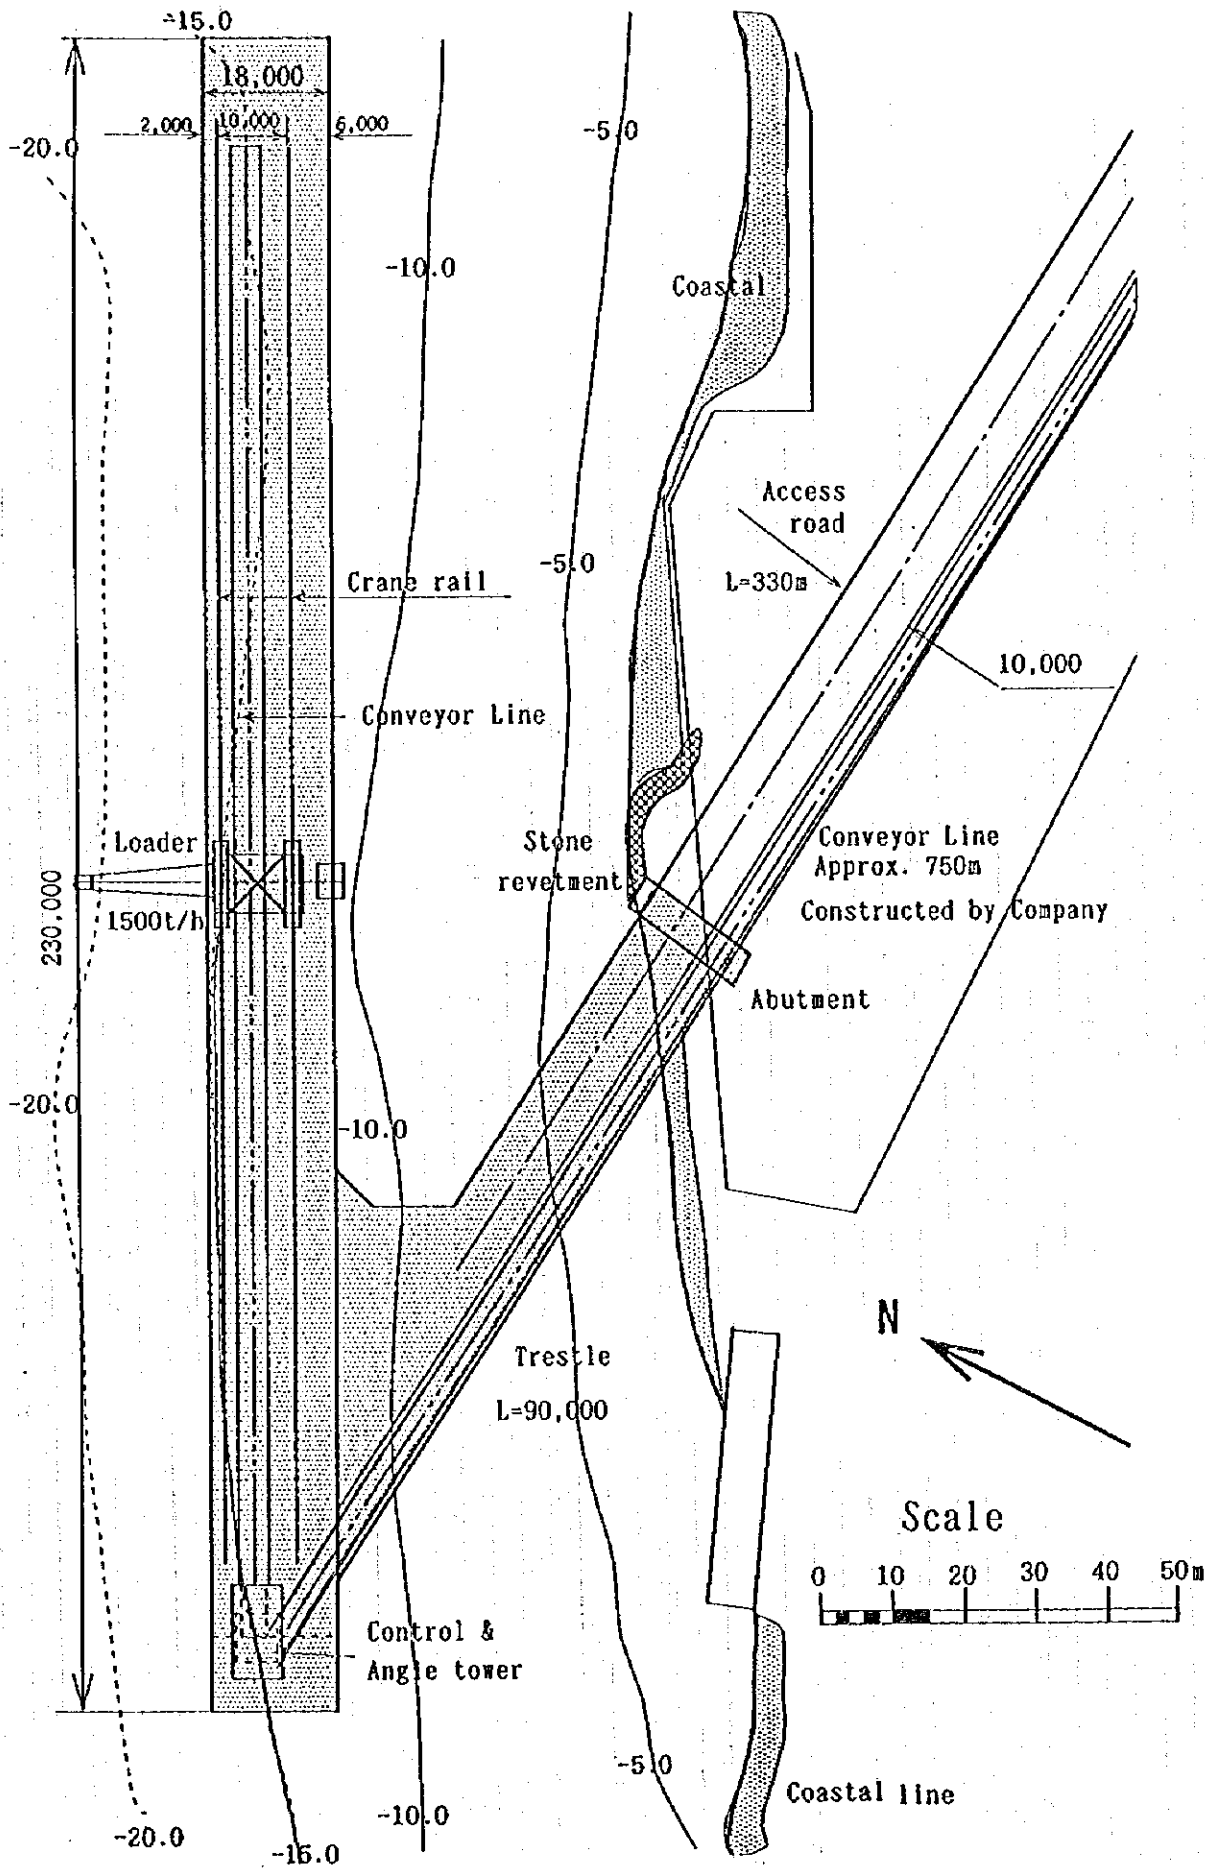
(2) Facility Layout of JFI-North Berth
